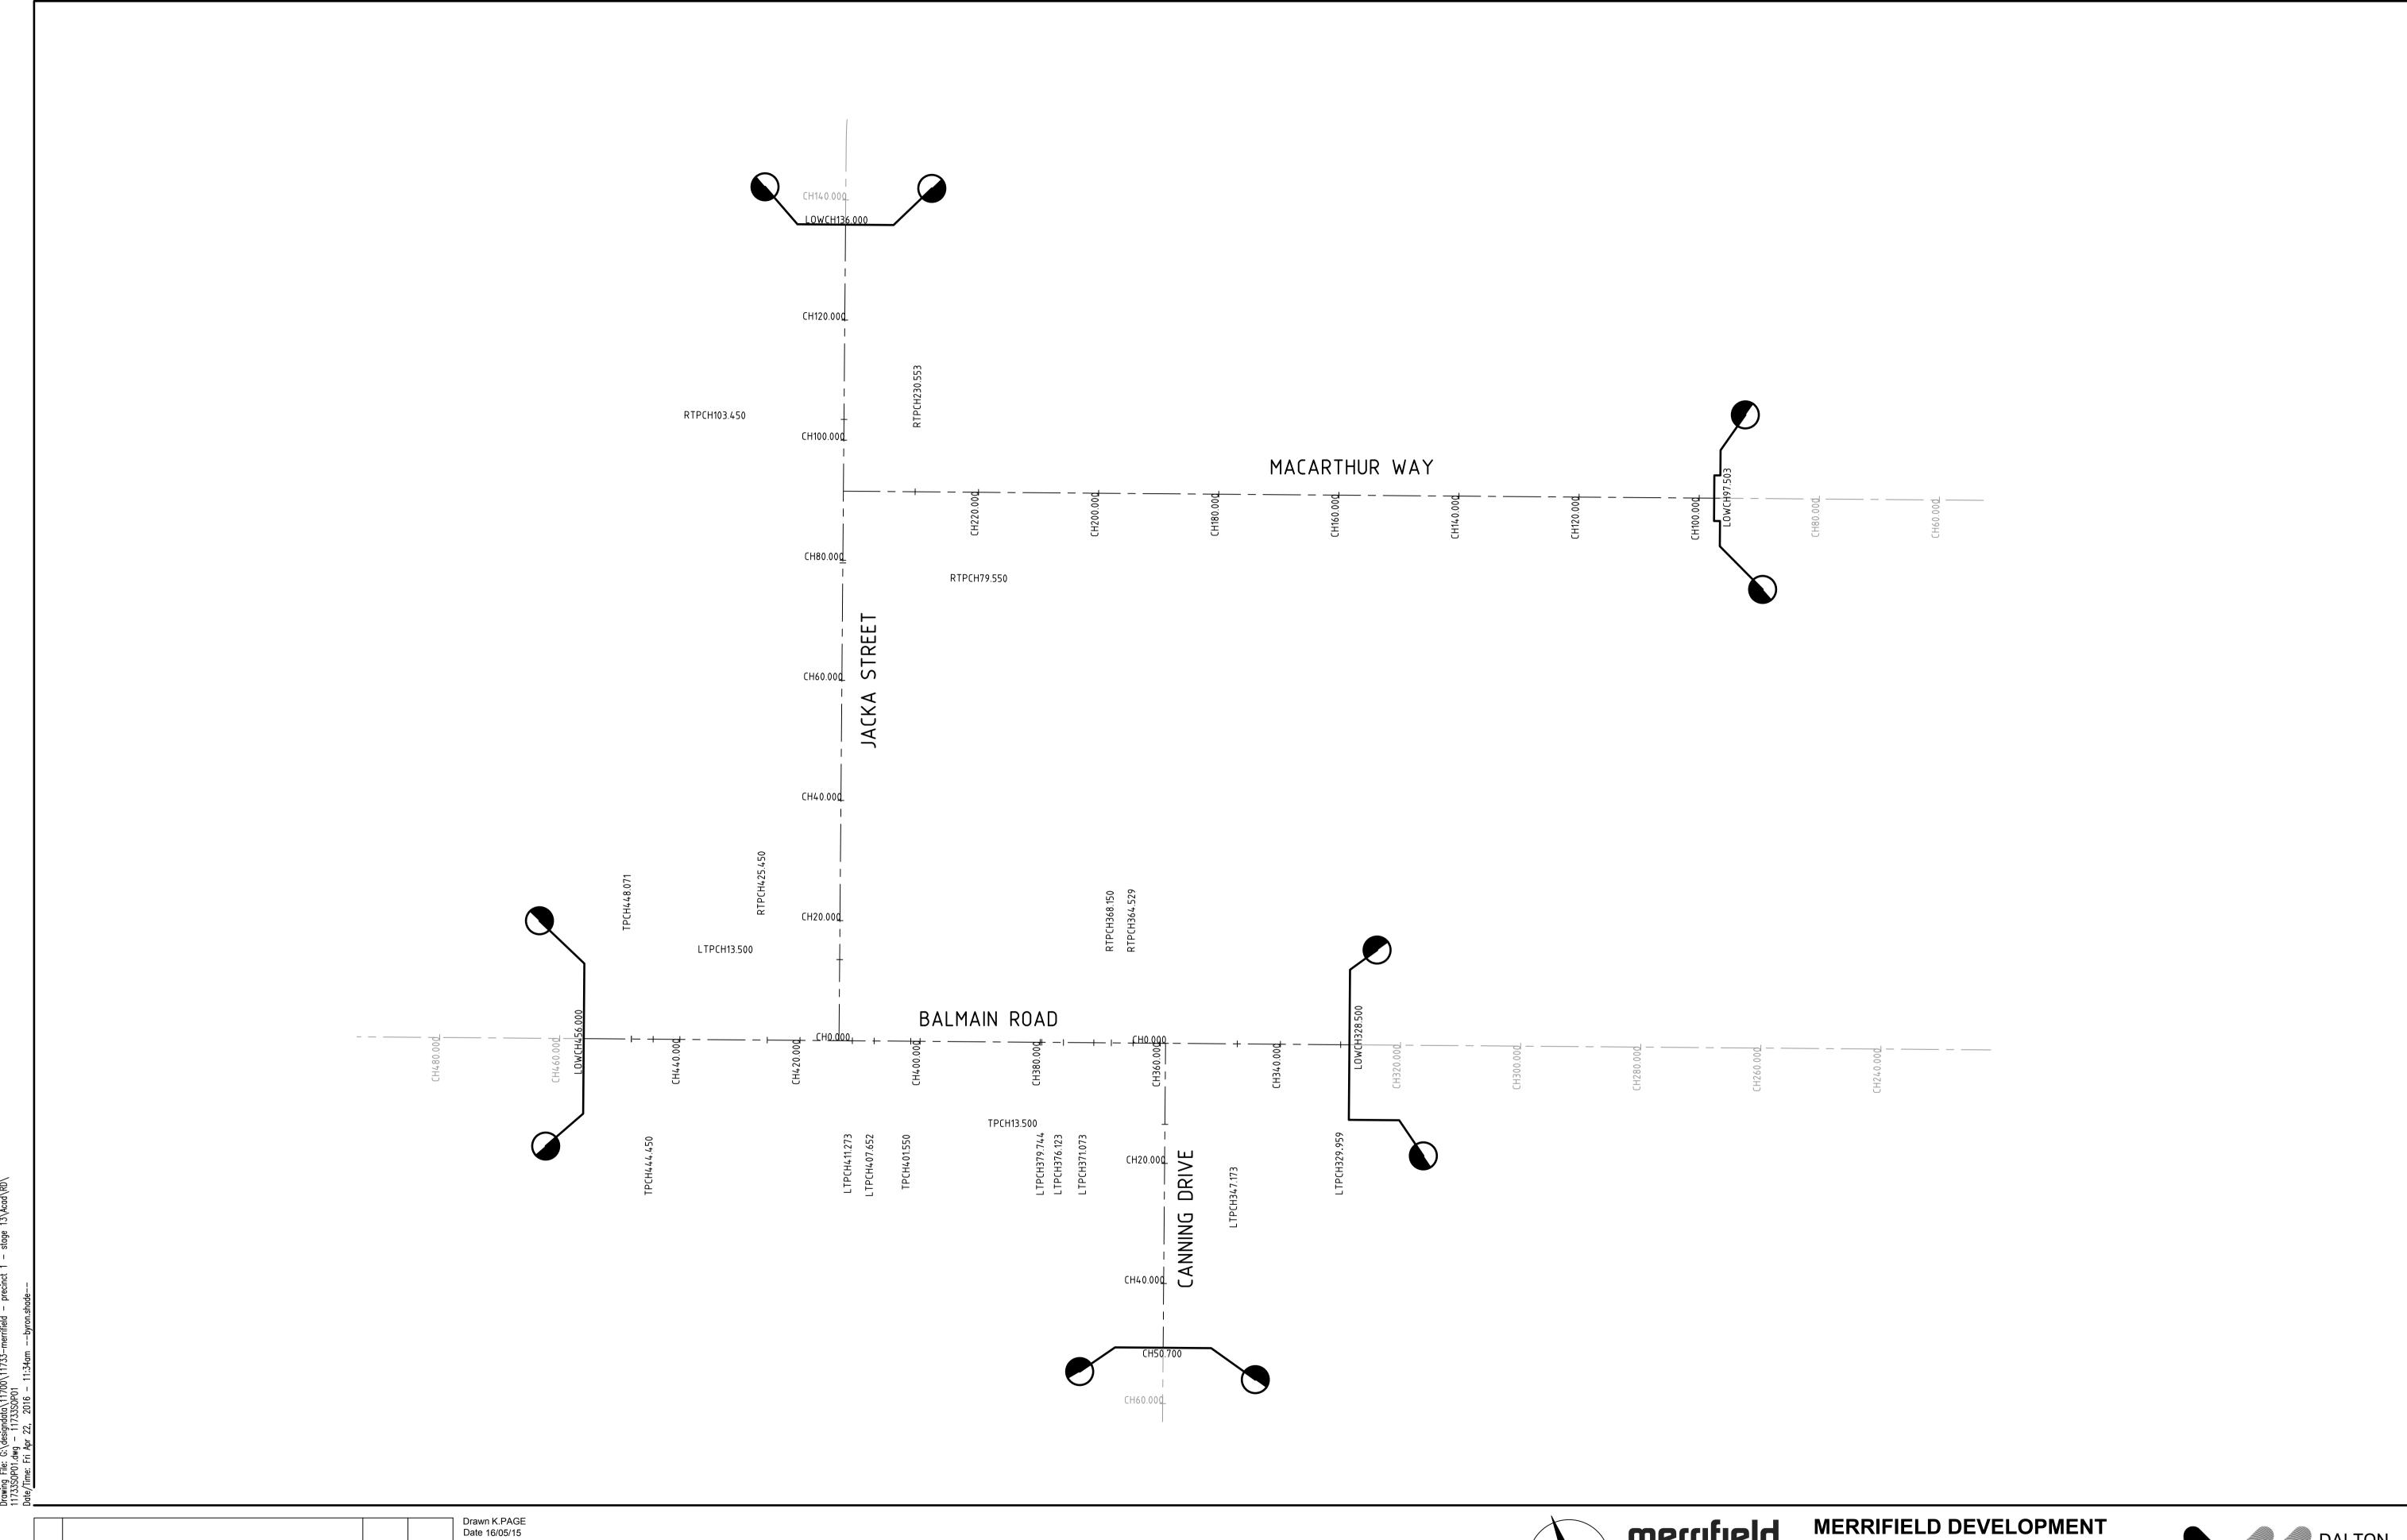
SP01 Rev 1 120m Sheet No. 03 AS CONSTRUCTED © Dalton Consulting Engineers Pty Ltd
